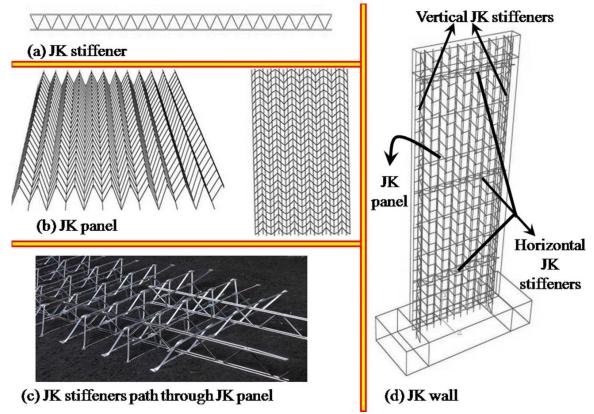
(a) JK stiffener, (b) JK panel, (c) JK stiffeners inside the JK panel, and (d) a schematic illustration of JK wall reinforcement
